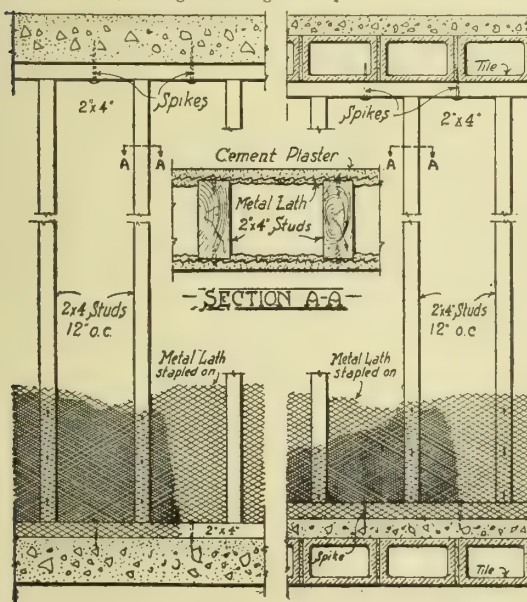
DETAIL OF HOLLOW WALL METAL LATH ON WOOD STUDDINGS
